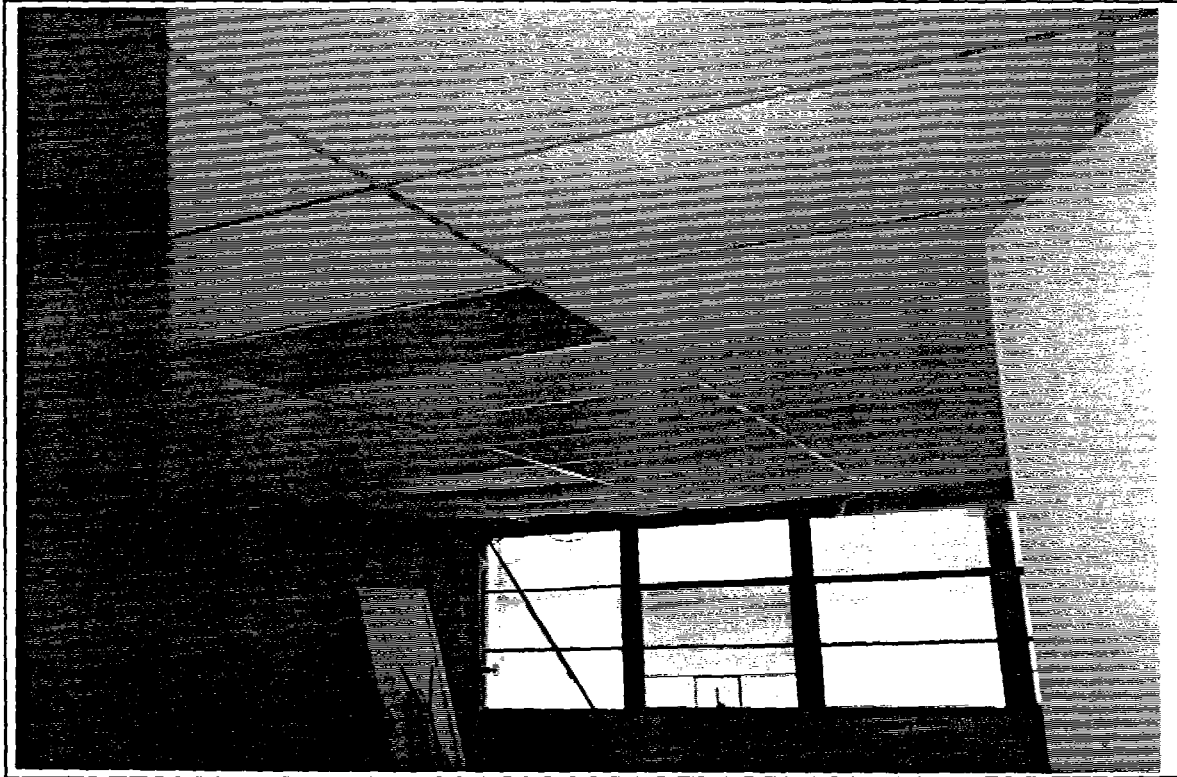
Building 31 - 2 ft x 4 ft non-asbestos white ceiling tile from south side office (Sample No. 1-059).
